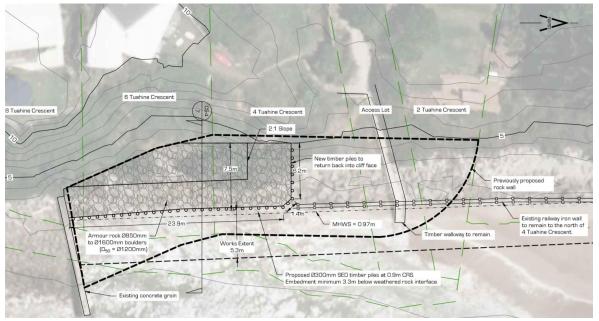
Plan taken from the application of the proposed wall in relation to the previously proposed rock wall by GDC.
